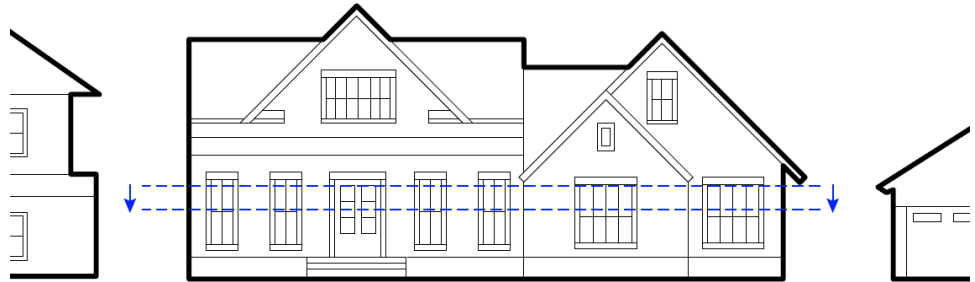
Lowering the roof eave can reduce the perceived height of the home, respecting neighboring single-story home.
